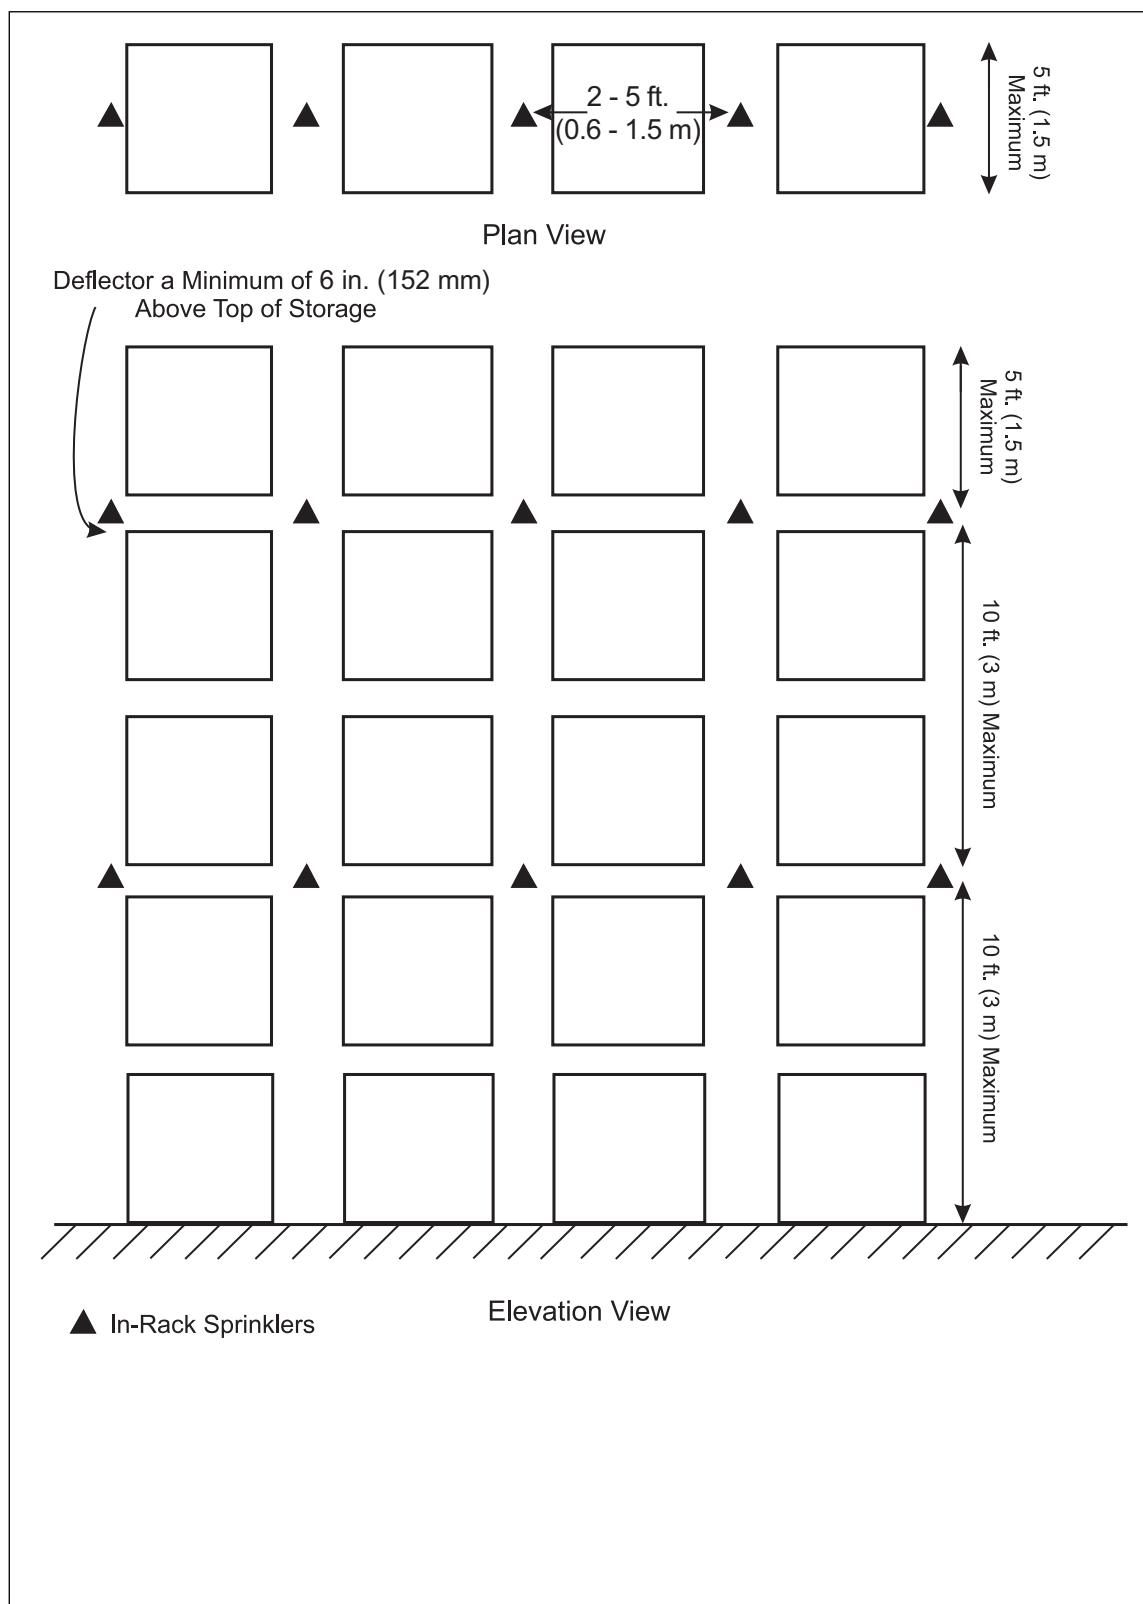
Single-row rack sprinkler layout: fire protection scheme C
